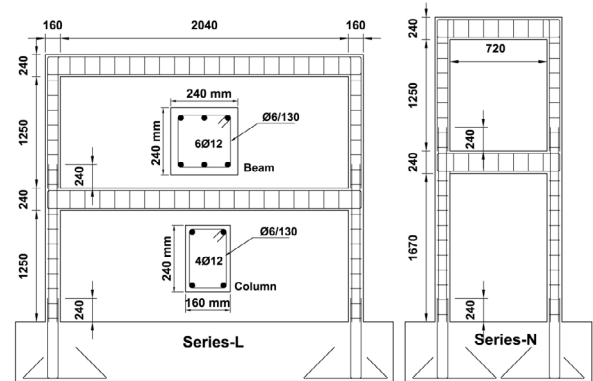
Reinforcement details of 1/2-scaled test specimens.
